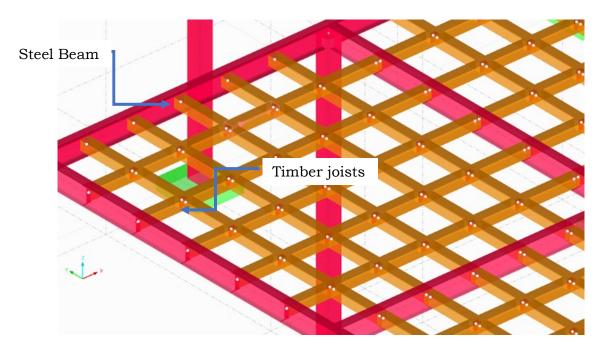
STC Current practice Form 2 Slab 3D Model
